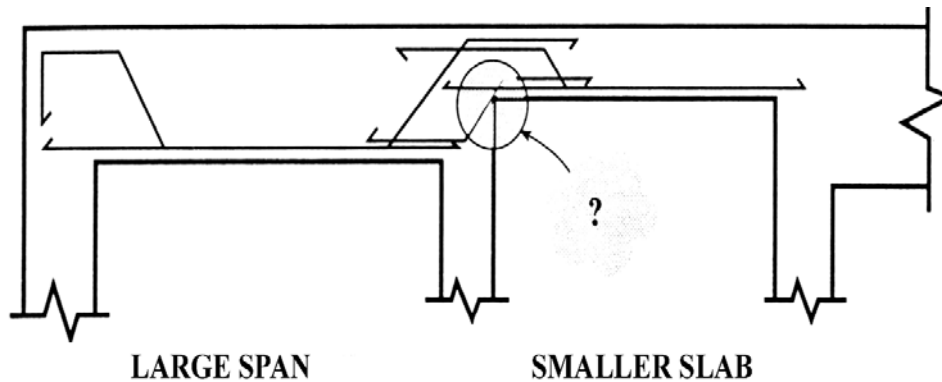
Joint Between Beams with Different Cross-Sections¹³⁰
